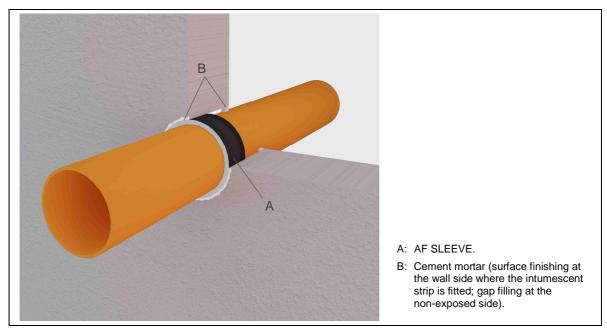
Example of plastic pipe penetration seal in a rigid wall.
